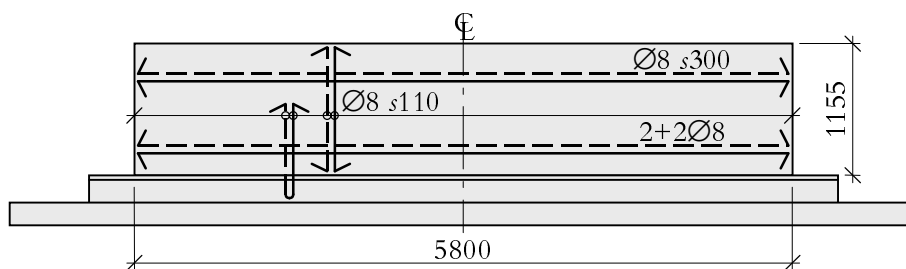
Elevation of walls in Test III and Test IV: measures and reinforcement. Measures in millimetres.
